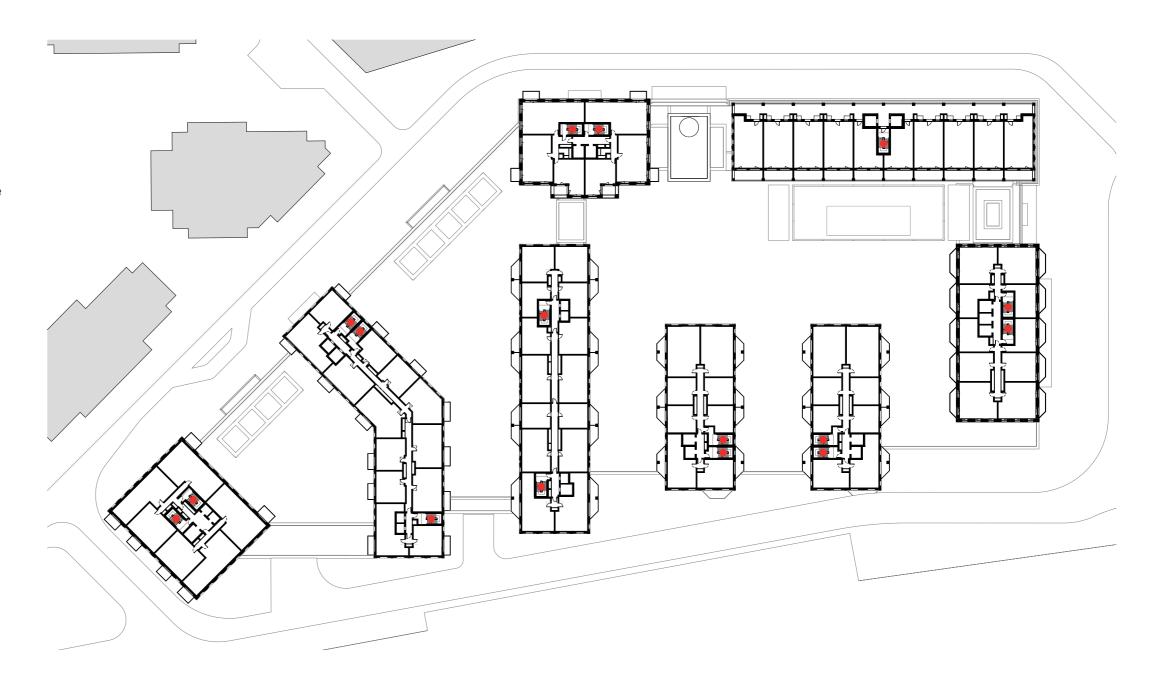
Building 2.6 - Example of linear/recessed balconies
